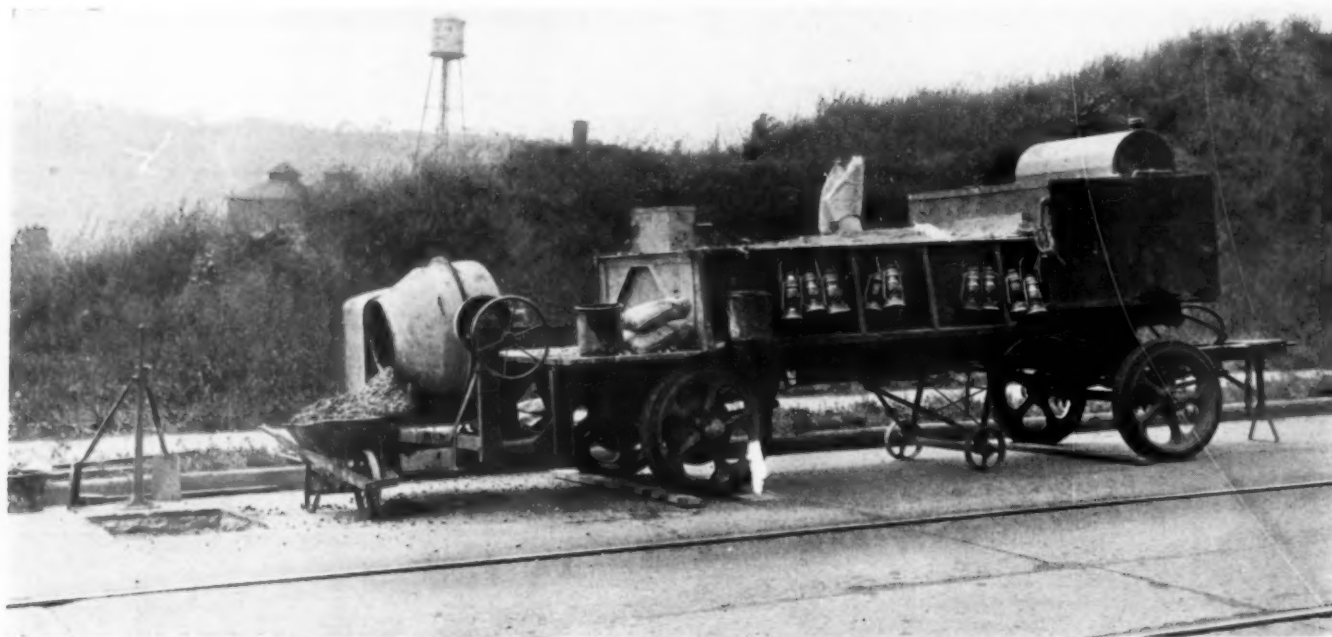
Equipment Used for Restoration of Service Cuts in Concrete Paved Streets and Street Having Concrete Bases
